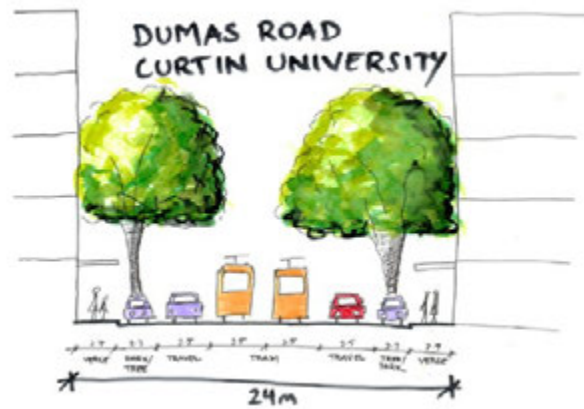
Curtin University site redevelopment – proposed Dumas Road section
